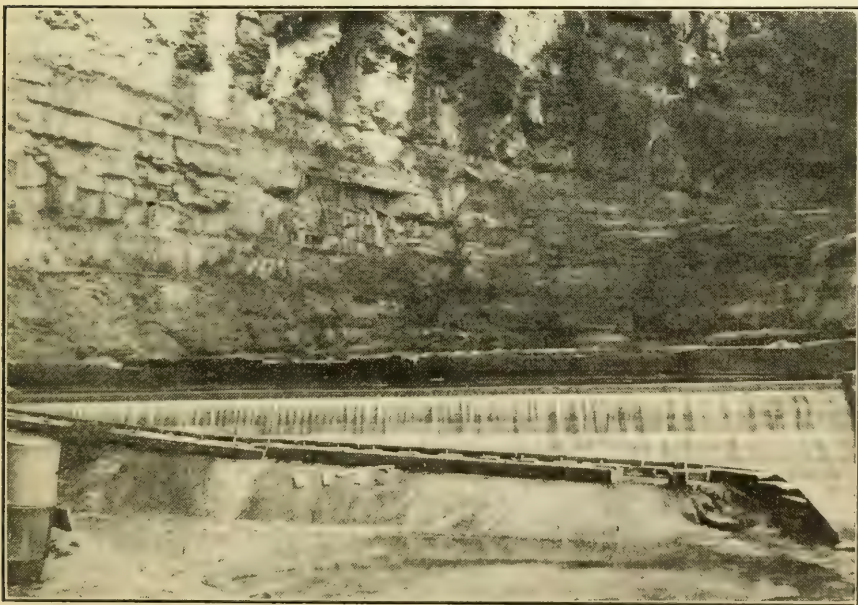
MODEL OF SECTION 16, GILBOA DAM, SHOWING EQUIVALENT HEAD OF 5 FT.
